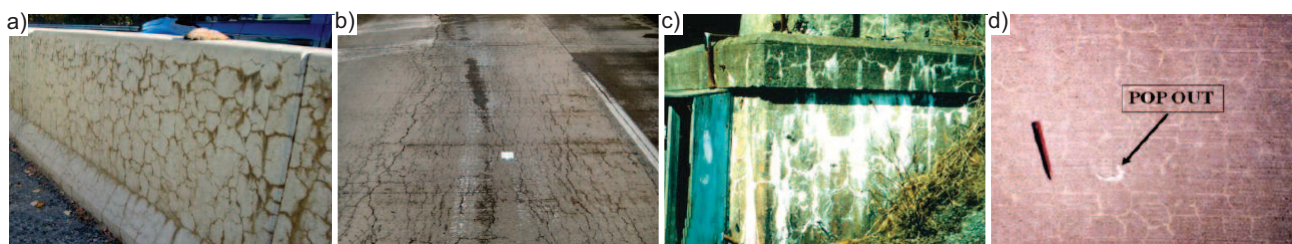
Concrete damage caused by alkali-silica reaction: a) crack map; b) surface cracks parallel to the edges; c) leaks and efflorescence on the surface; d) pop-out [2]
